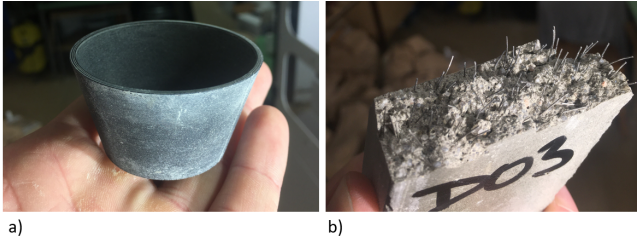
a) 3D printed slump test cone b) SFRC sample .
